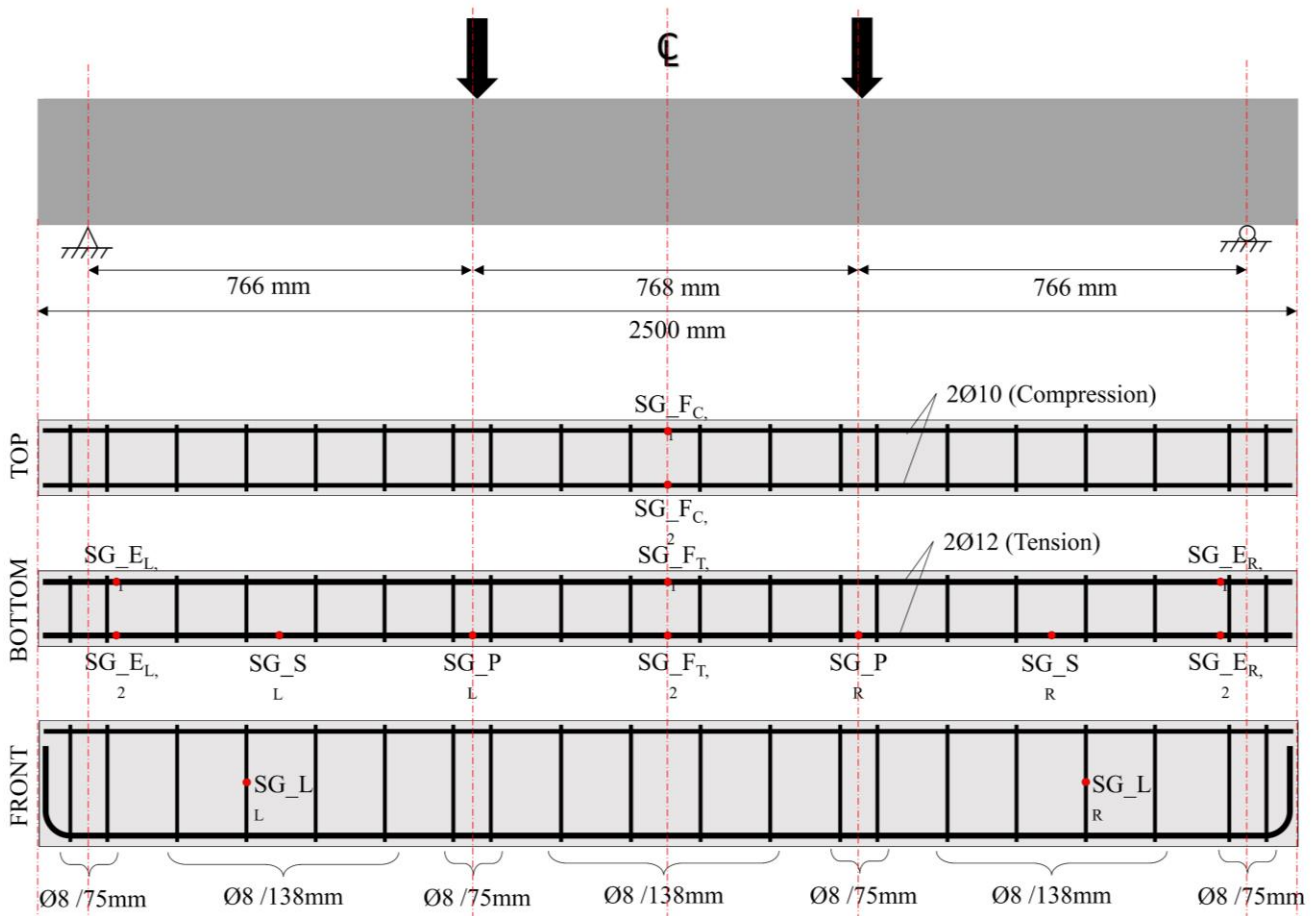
Detailing of internal reinforcement and the layout of strain gauges for a typical beam.
